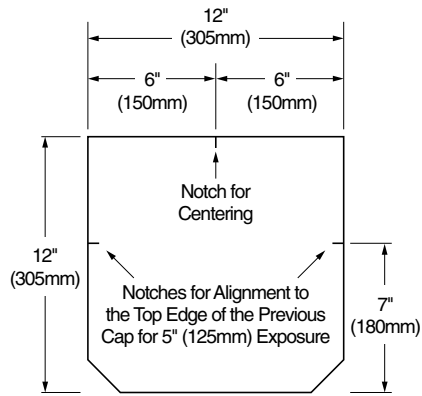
Each Shadow Ridge shingle has a centering notch and two side-alignment notches to help ensure proper placement.
